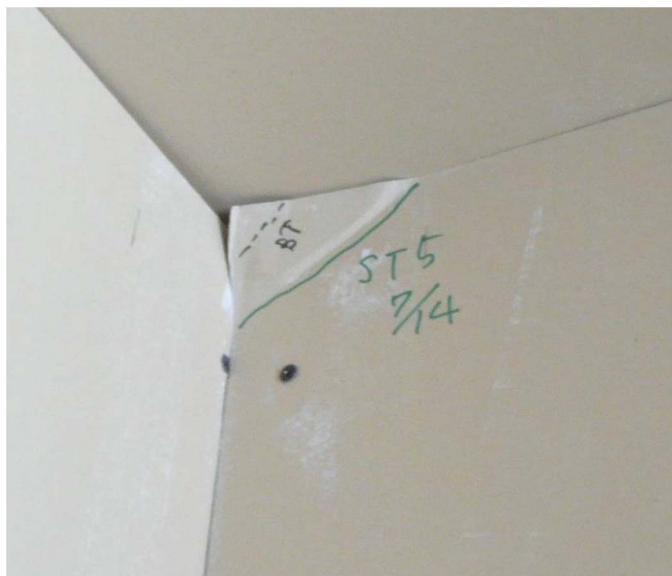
Crushing of corners also seen at Story 6, Wall E5 after seismic test
